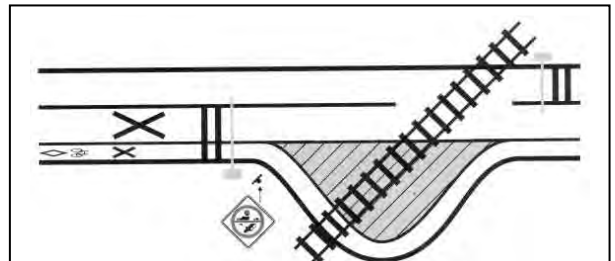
Skewed Railroad Crossing Unrestricted Right-of-Way Width with Gate Control
